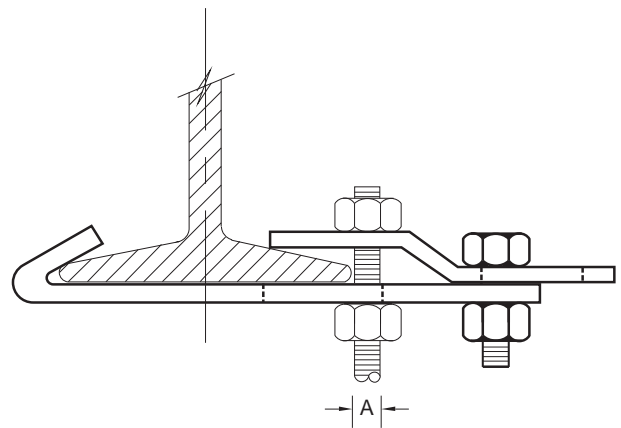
ADJUSTABLE SIDE BEAM CLAMP
